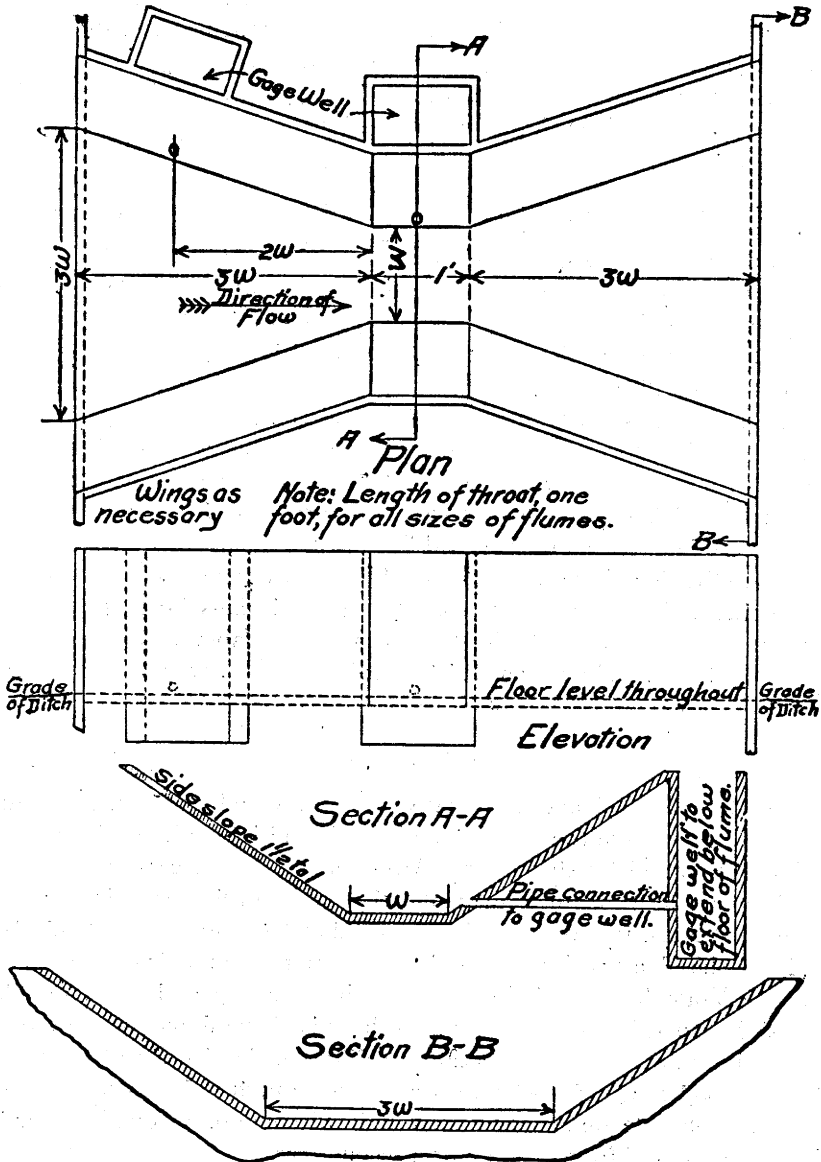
Standard plans for the Venturi flume with trapezoidal cross section.
